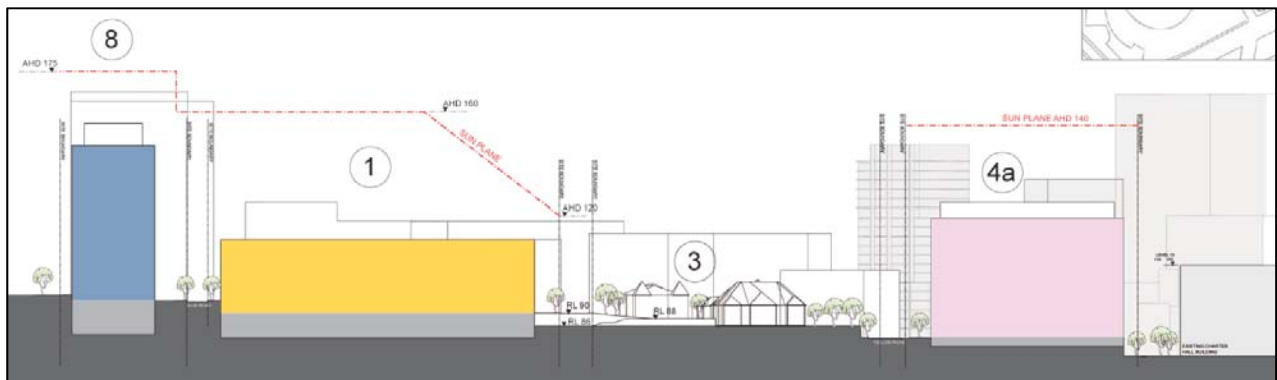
Western Elevation Hospital Campus Cross-section (source: MP 06_0051 Preferred Project Report)
